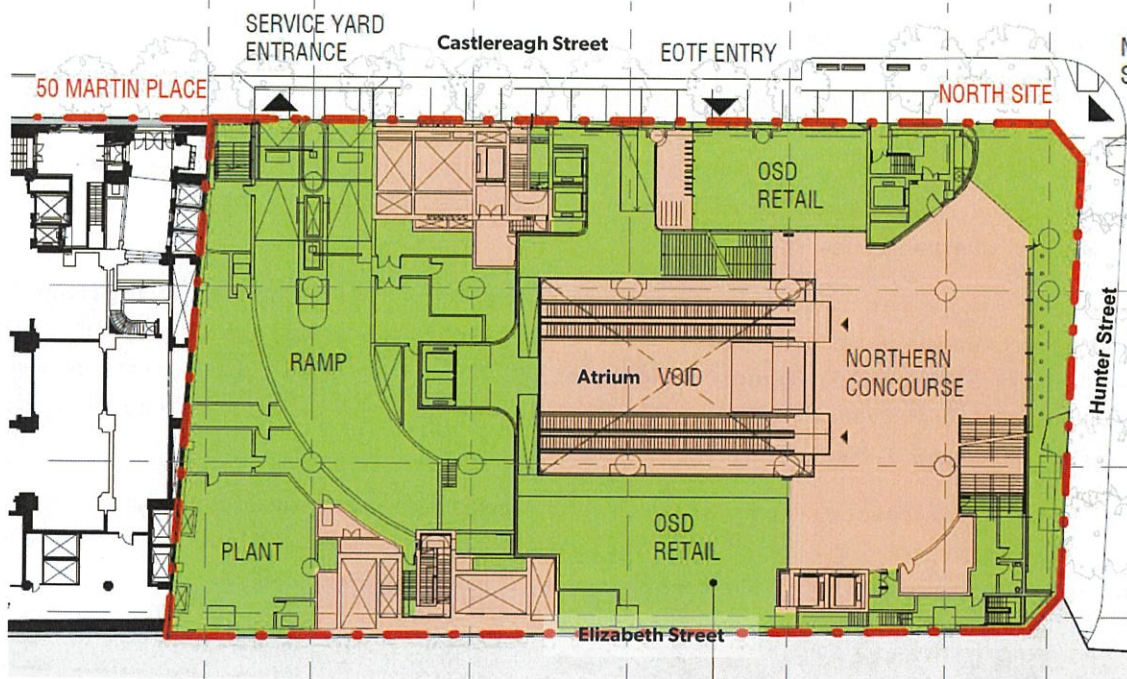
| Demarcation drawing of lower ground floor level (Castlereagh Street level). Green highlighted areas are considered OSD-related works. Pink highlighted areas are considered CSSI-related works (Source: Applicant's RtS)
